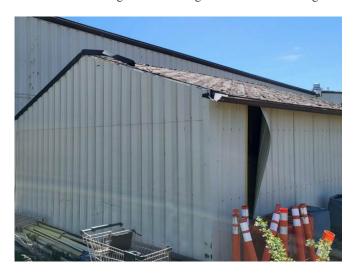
Storage Shed - Dislodged Wall Metal Cladding
